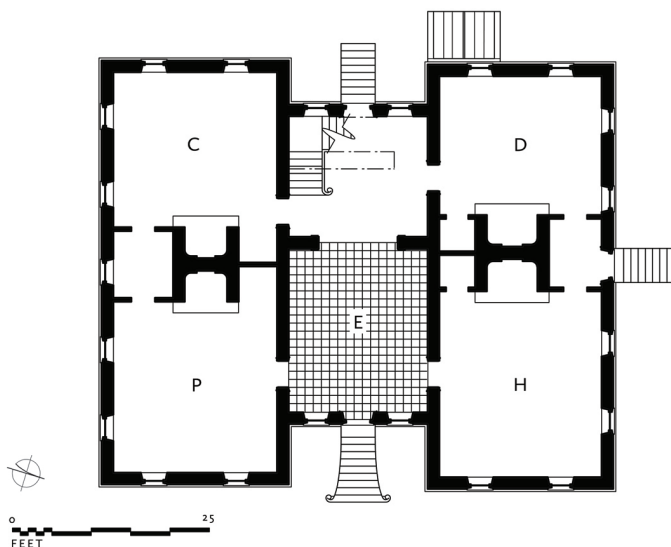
Hypothetical first floor plan. C, chamber; D, dining area; H, hall; P, parlor; E, entry hall.
